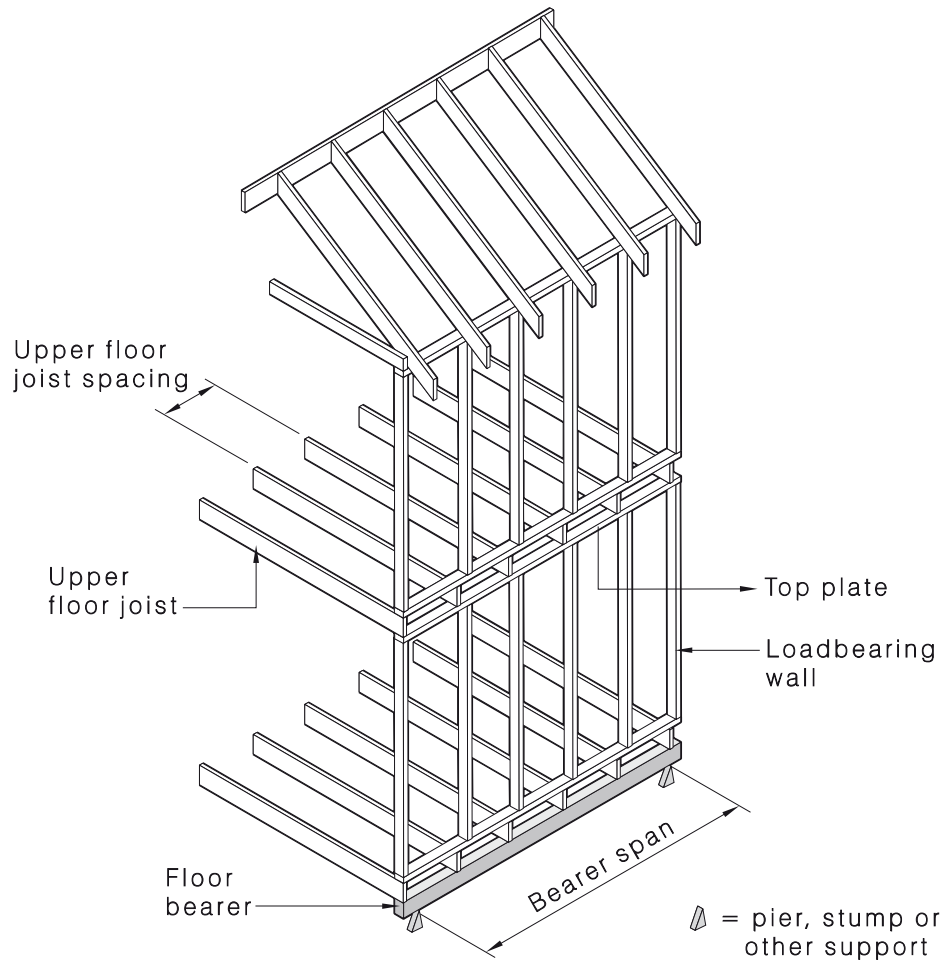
BEARERS SUPPORTING LOADBEARING WALLS—
